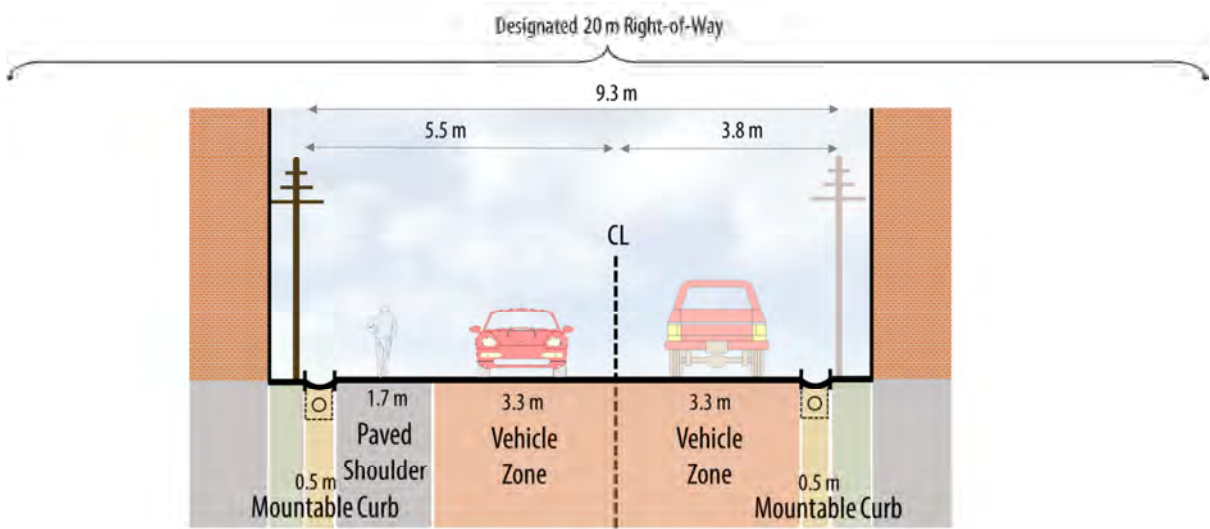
9.3 m Platform Semi-Rural Cross-Section with Paved Shoulder for Belfountain Village (Community Centre to north/west of Caledon Mountain Drive)
